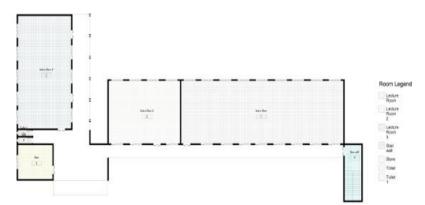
Floor Plan Showing Arrangement and Transition between Spaces, U.I. Source: Author's fieldwork, 2016
